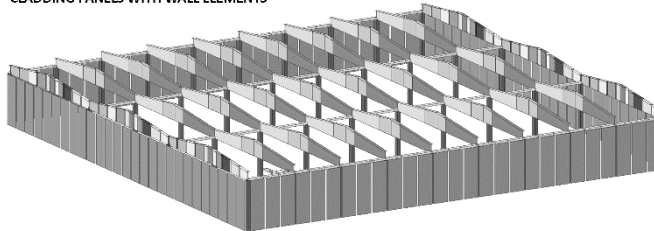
Cladding panels with beam, shell and wall elements for the main case study.
